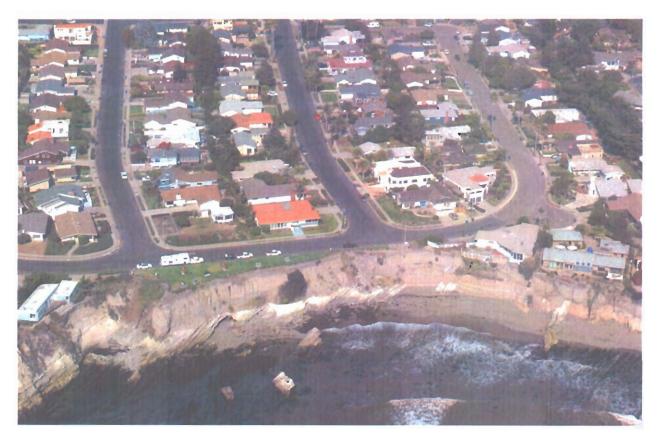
Vista del Mar Site Vertical Wall length of the proposed seawall would extend farther north than the existing seawall which would address end effect erosion risks to the lift station associated with the existing seawall. Additionally, the soil backfill and bluff-face shotcrete application would help to stabilize the bluff at this location, where the lift station is already very close to the edge of the bluff.
